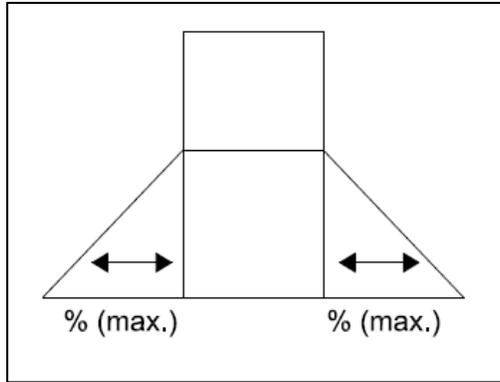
B - Perpendicular Curb Ramp Cross Slope
